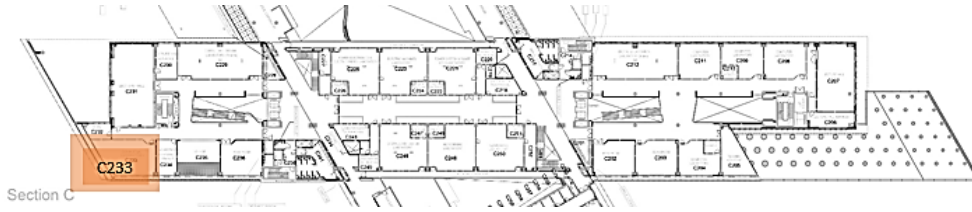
First floorplan of Section C, H07 – CADD laboratory (not to scale)
